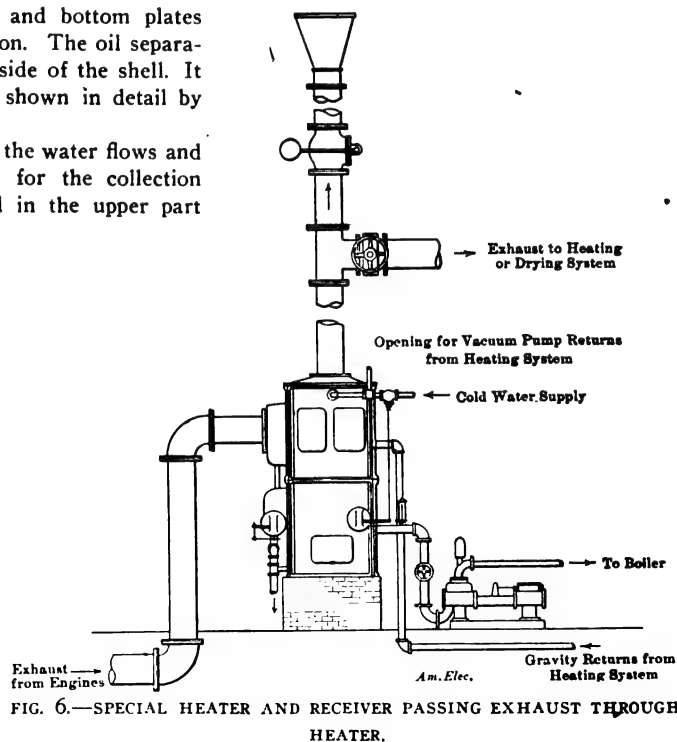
SPECIAL HEATER AND RECEIVER PASSING EXHAUST THROUGH HEATER.
